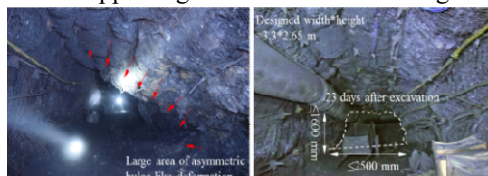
Failures for excavations supported by combined measures of end-encapsulated bolt, steel net, and ladder bar
